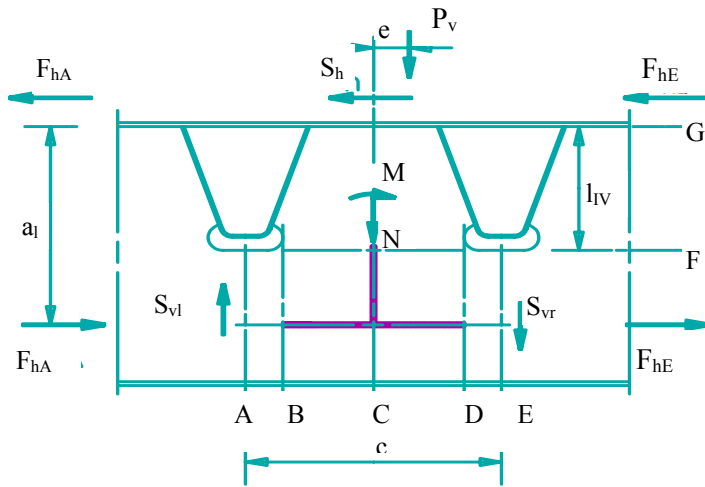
Arrangement of internal forces and external loads on the crossbeam web
